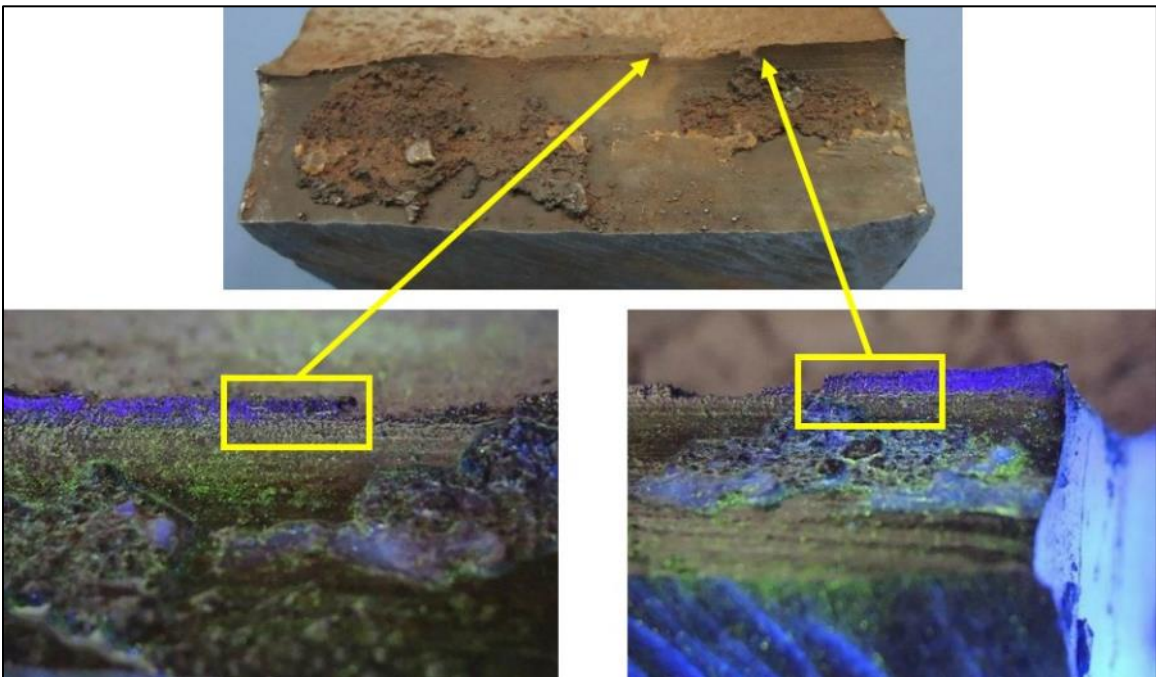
Secondary cracking in the radius of the weld access hole of sample D.4-NW as identified by fluorescent magnetic particle testing.
